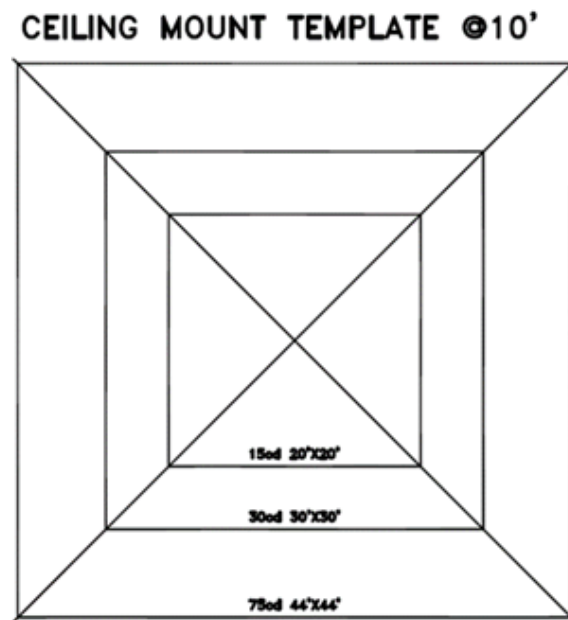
Ceiling mounted fire alarm coverage template at 10 feet high
